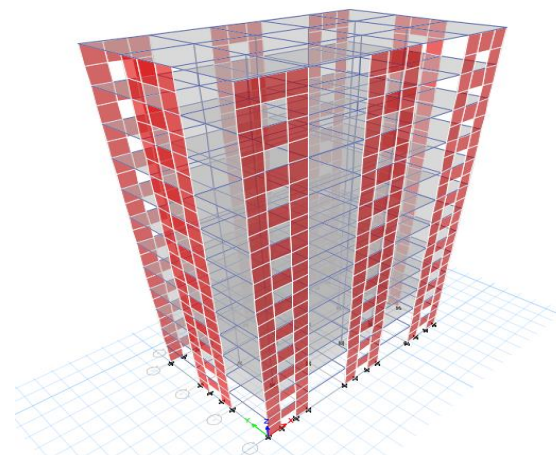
3D of Coupled Shear Wall Structure Model 03
